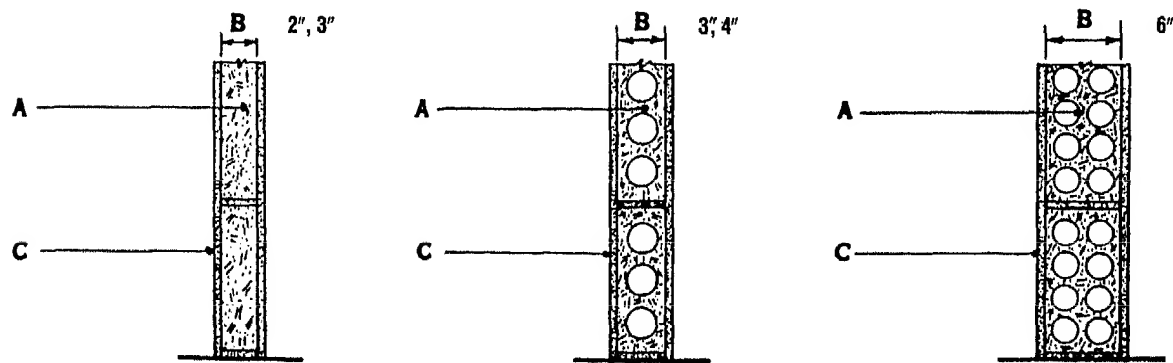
Gypsum tile or block: nonbearing (sections). A = gypsum block, B = nominal wall thickness, C = finish.
